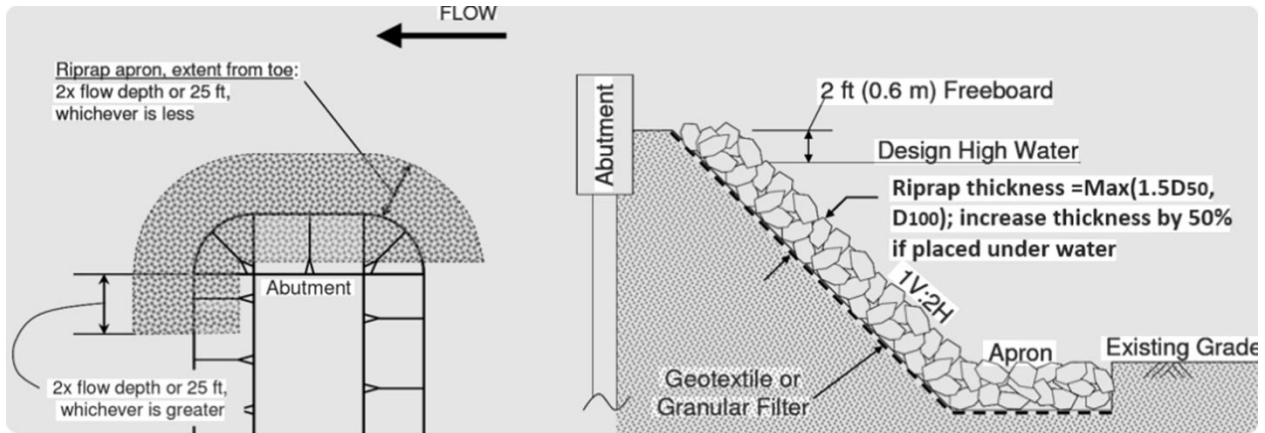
Depicts Rip Rap placement around the bridge abutment.
